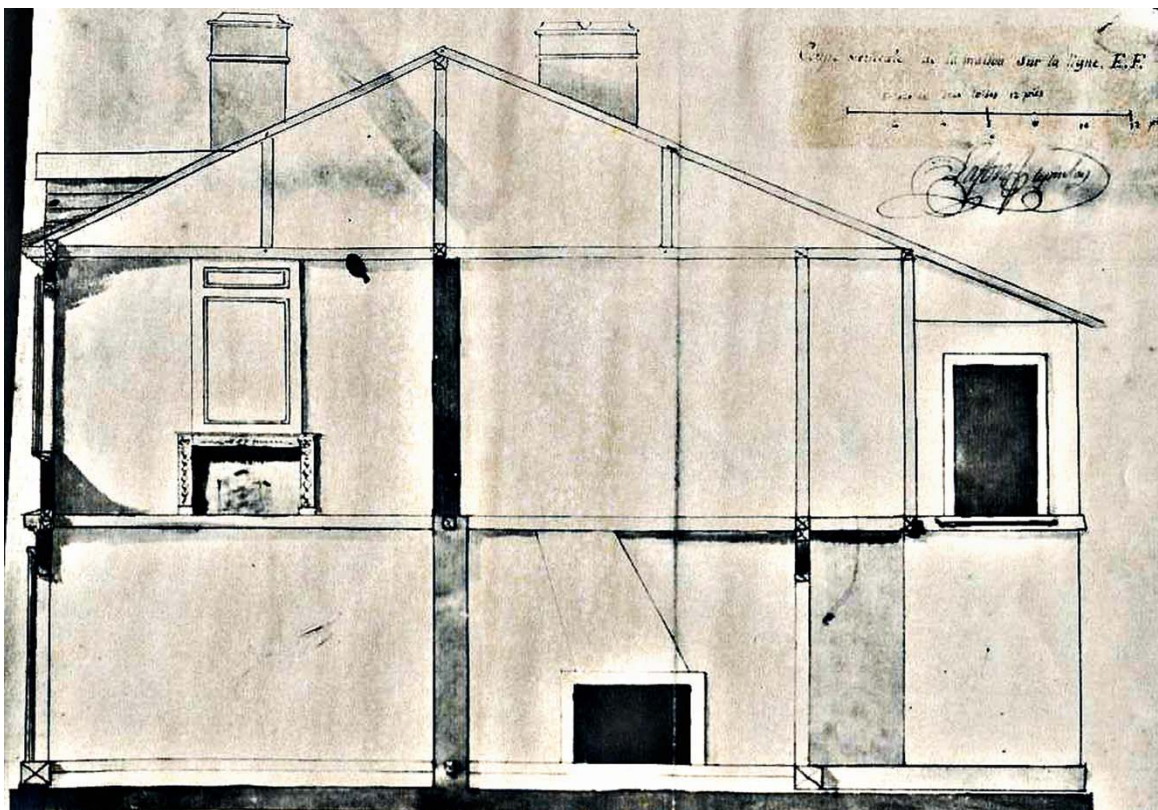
Section View: Lafon's plan for the Mlle. Macarty house, to be built at 401 Decatur Street, corner Conti, in 1795. This was a timber frame house raised on brick posts, with front balcony and rear cabinet and loggia rooms. Plan from the Louisiana State Museum, Spanish Colonial Records No. 3361.
